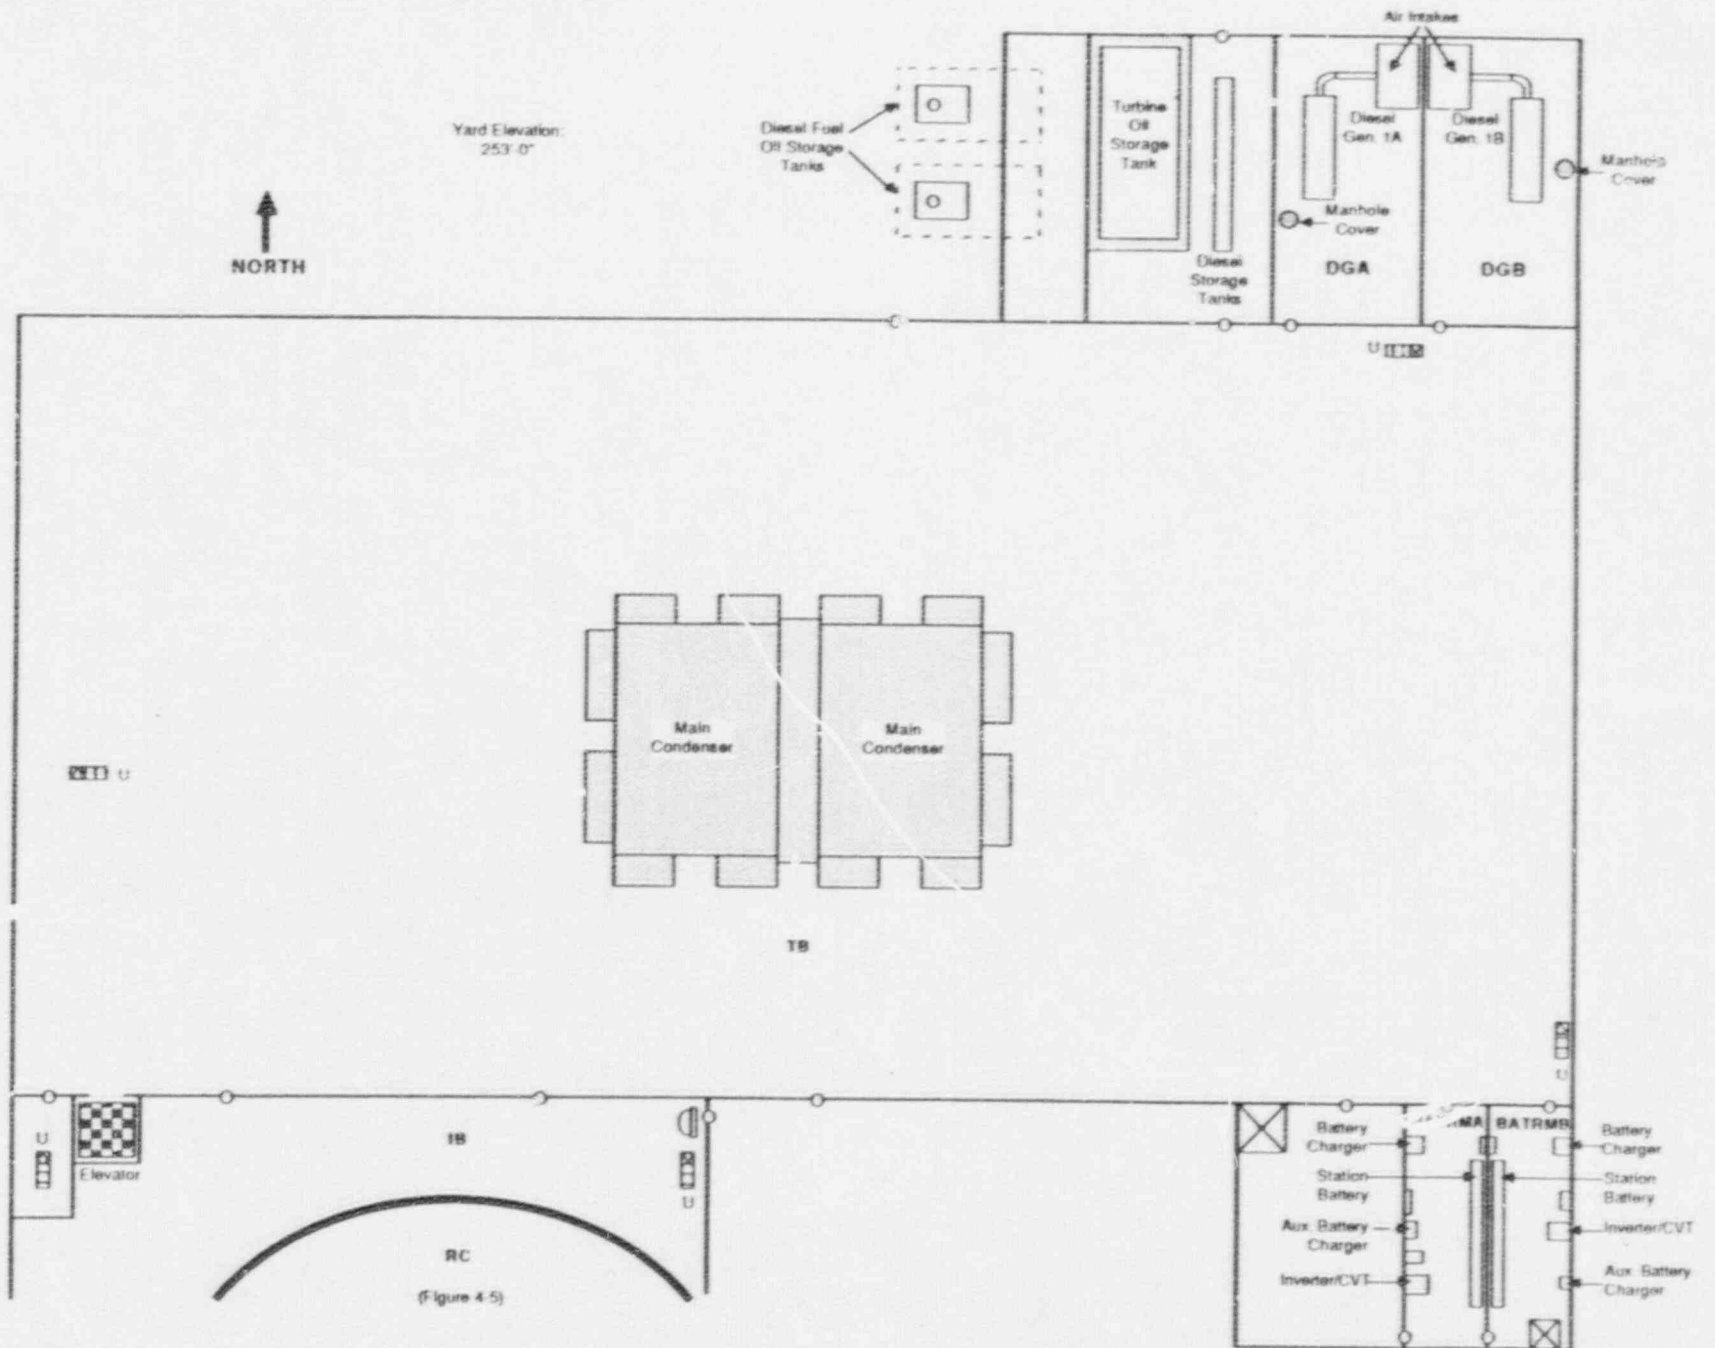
Ginna Turbine Building, Elevation 253'-6"
